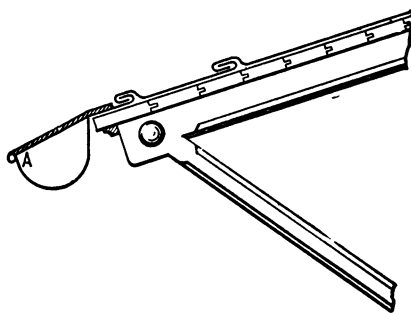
Section of Hanging Gutter with Lock Attached for Eaves of Pitched Tin Roofs.
